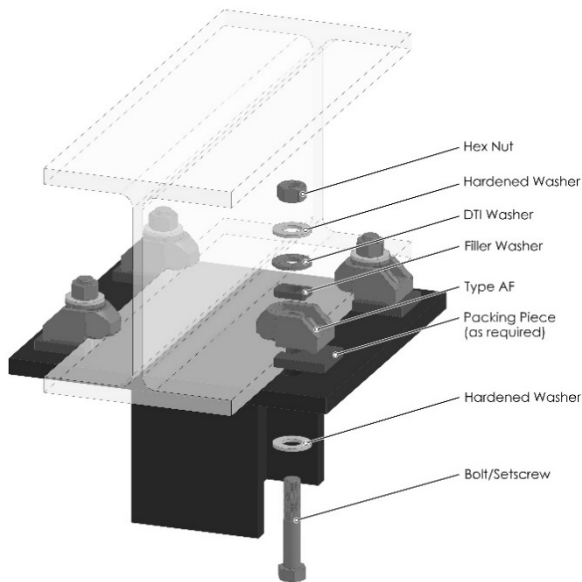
GIRDER CLAMP CONNECTION WITH END PLATE (TYPE AF CLAMP / DTI BOLT ASSEMBLY SHOWN)
